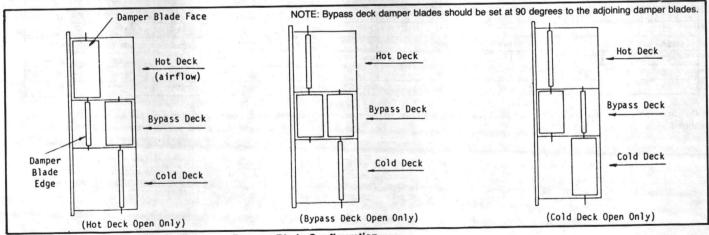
B - Proper Three-Deck Multizone Damper Blade Configuration
